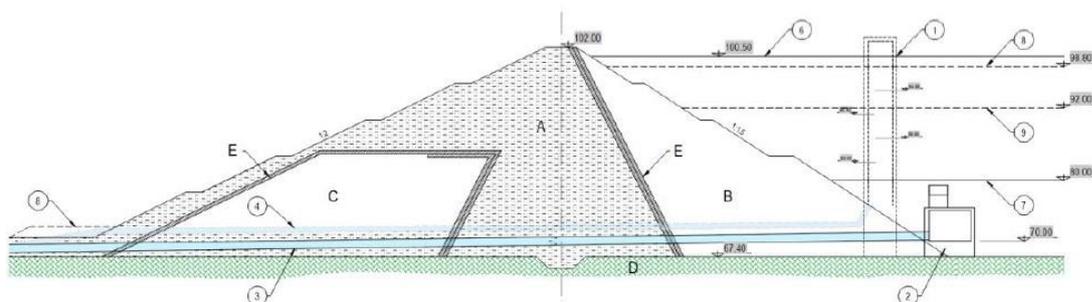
Typical cross-section of the dam, gde je: A – clayey silt material; B – rockfill material; C – limestone and sandstone blocks; D – impermeable rock base; E – filter material; 1 – intake tower; 2 – intake structure; 3 – bottom outlets; 4 – irrigation pipeline; 6 – maximal reservoir level (100.5 m asl); 7 – minimal operating level (80.0 m asl); 8 – normal operating level (98.8 m asl); 9 – depleted operating level (92.0 m asl).
